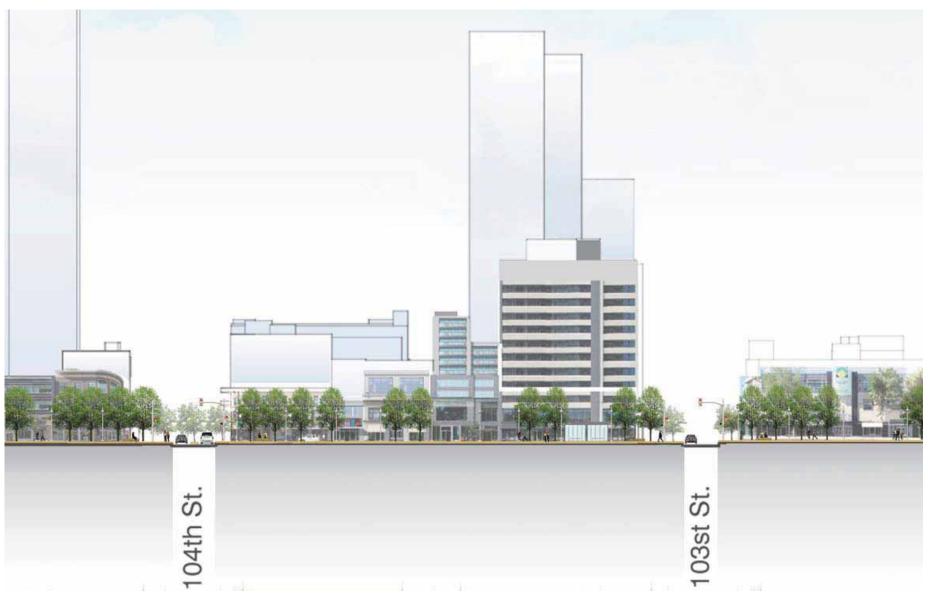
Demonstration North-Sdie Elevation 104th to 103rd
